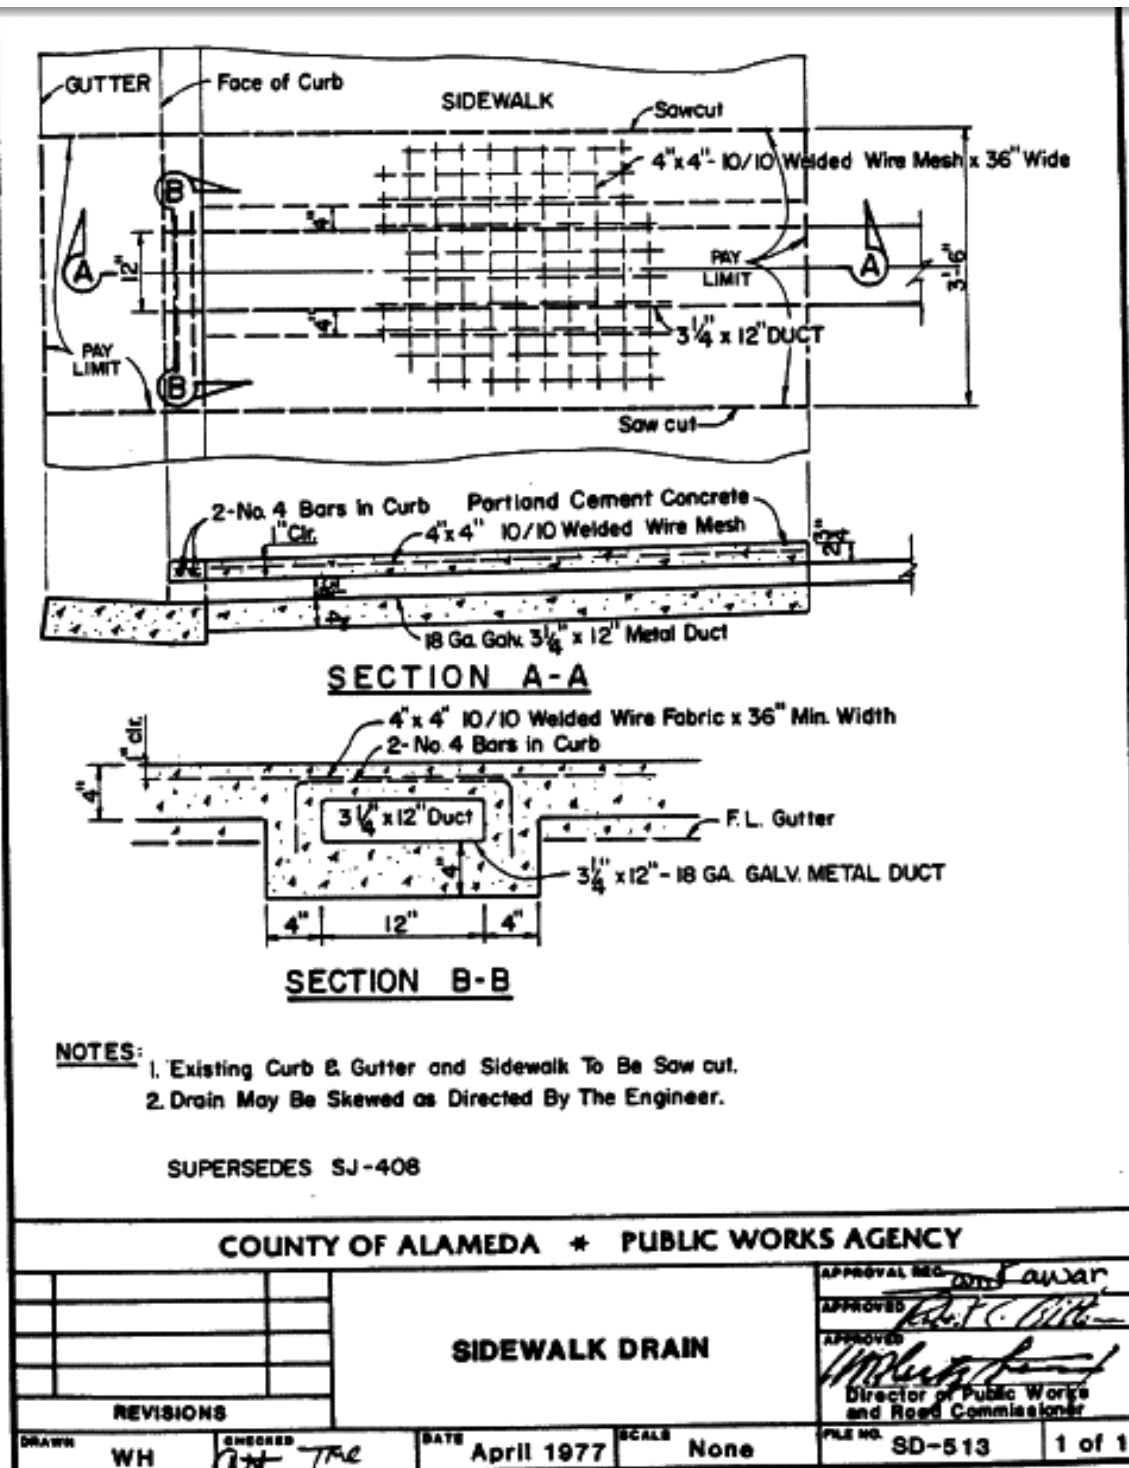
Alameda County Standard Detail 513, Sidewalk drain. This design may be used, as an alternative to plans shown in figures 5-19 and 5-20, to drain water from street gutter, across sidewalk, to stormwater treatment facility.
